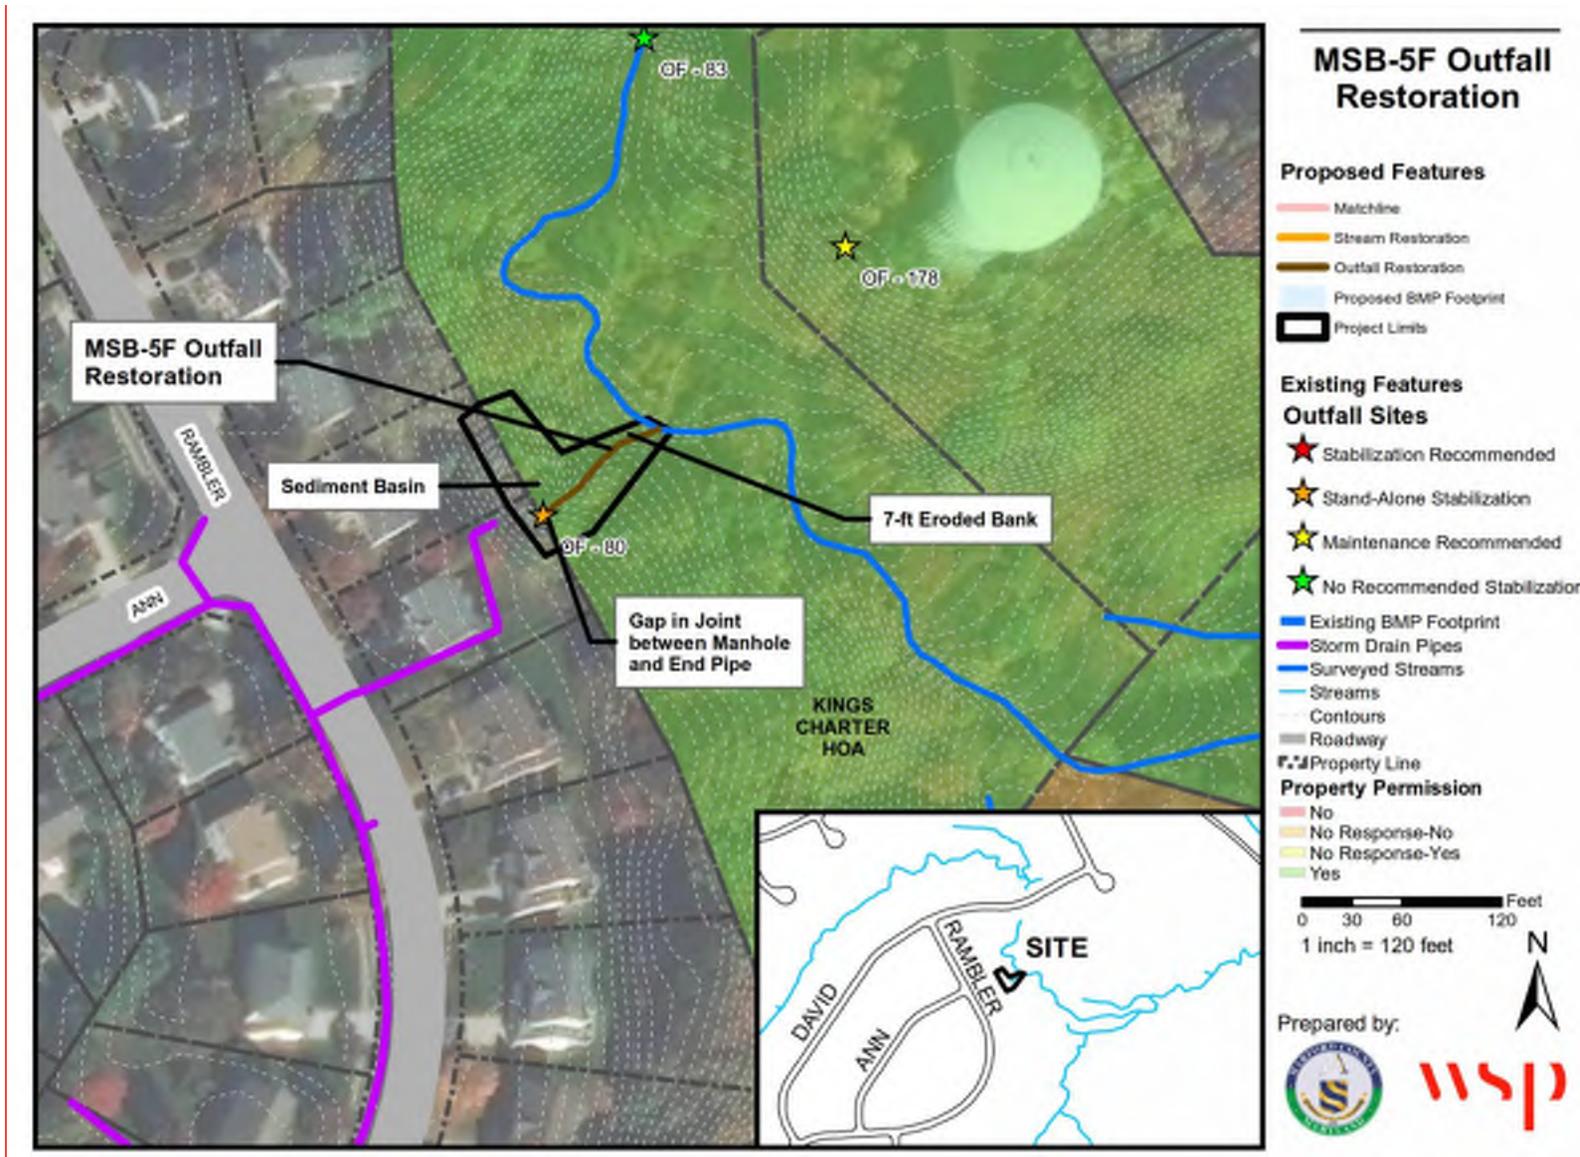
Site Location and Proposed Project Plan for MSB-5F Outfall Restoration
